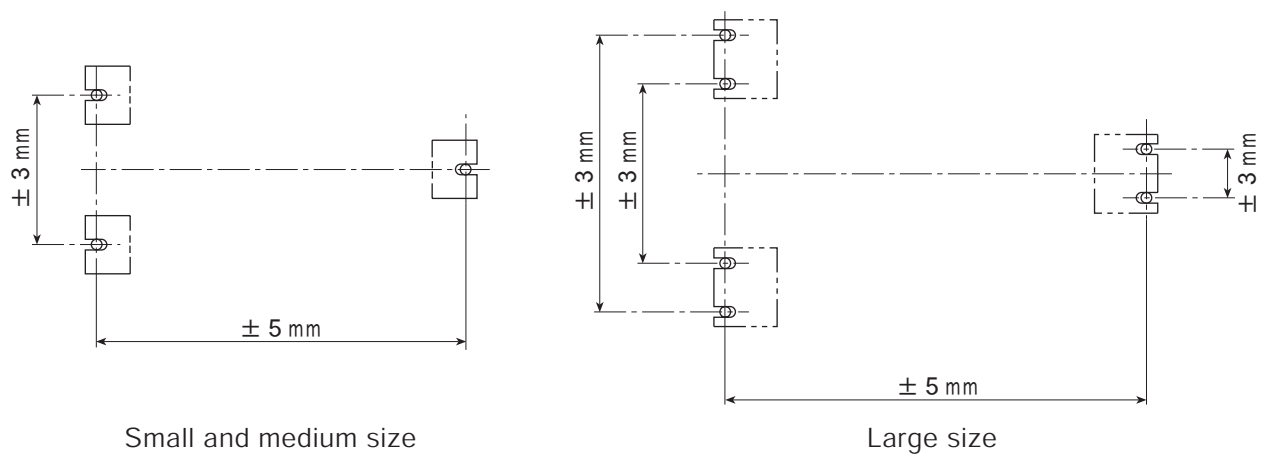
Anchor Bolt Pitch and Tolerance
